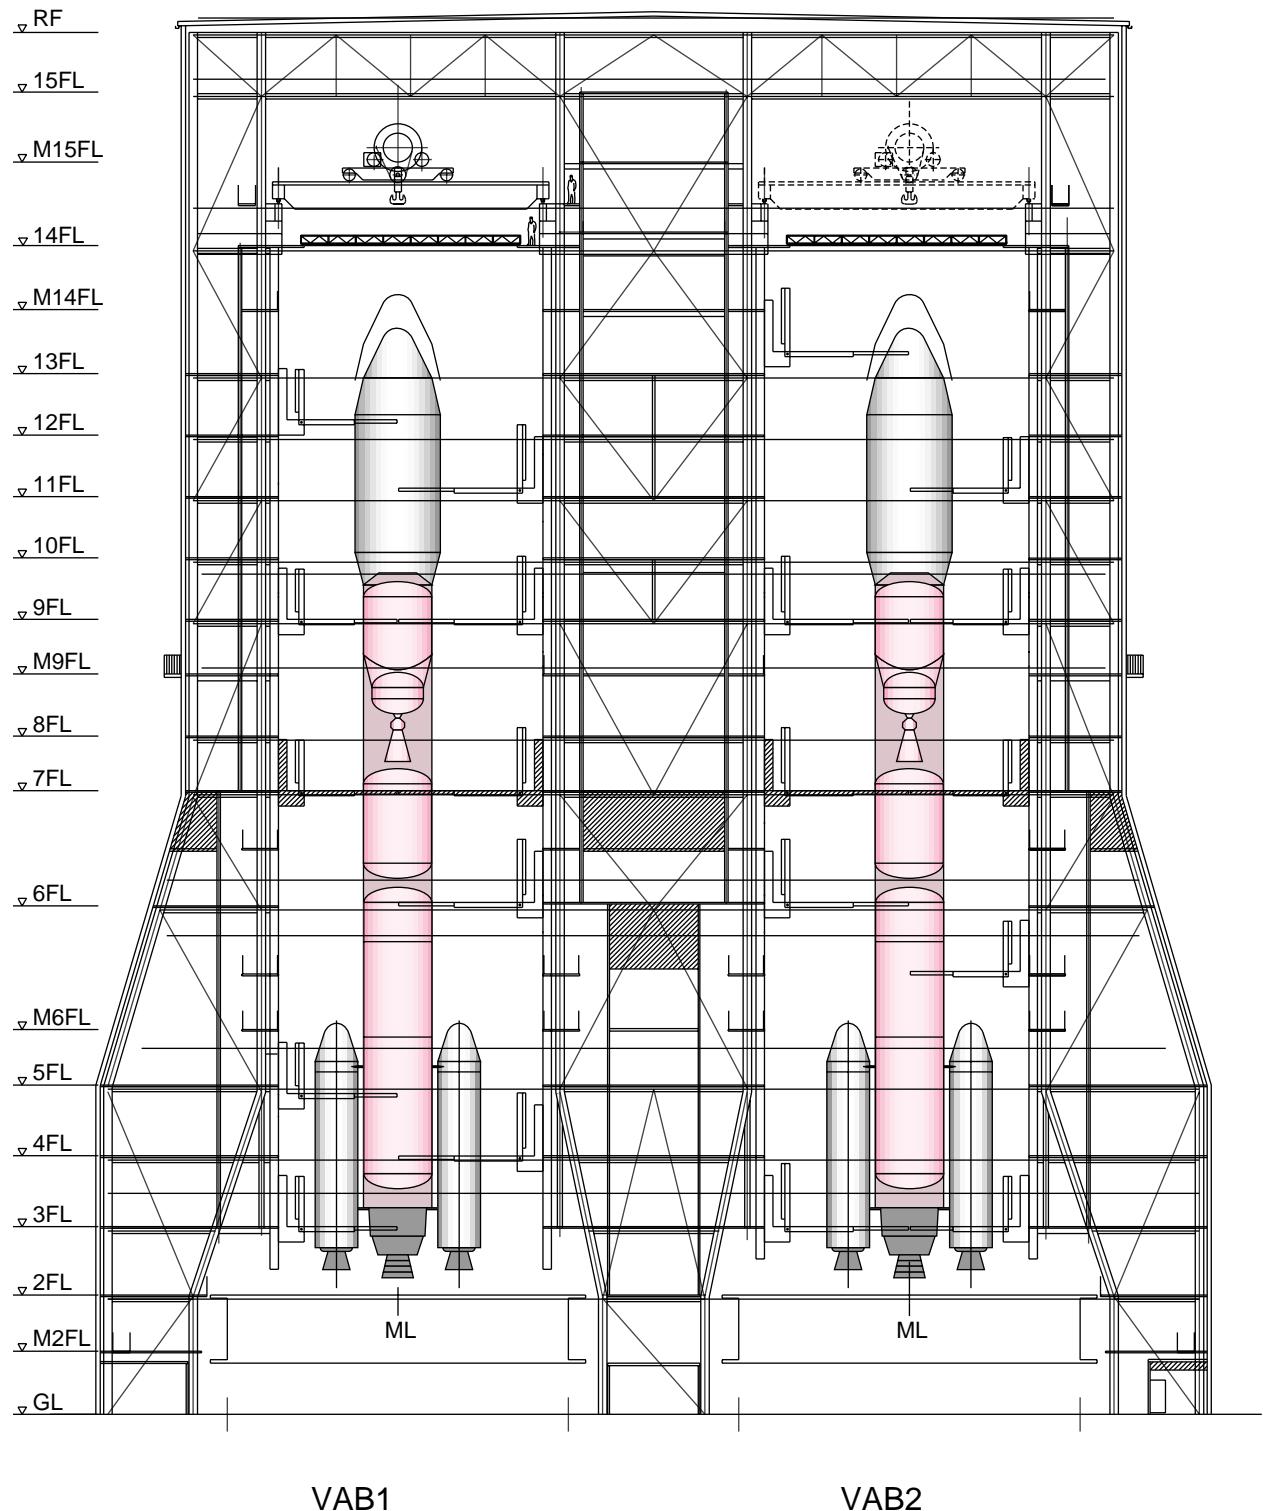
Yoshinobu Vehicle Assembly Building (VAB, sectional view)
